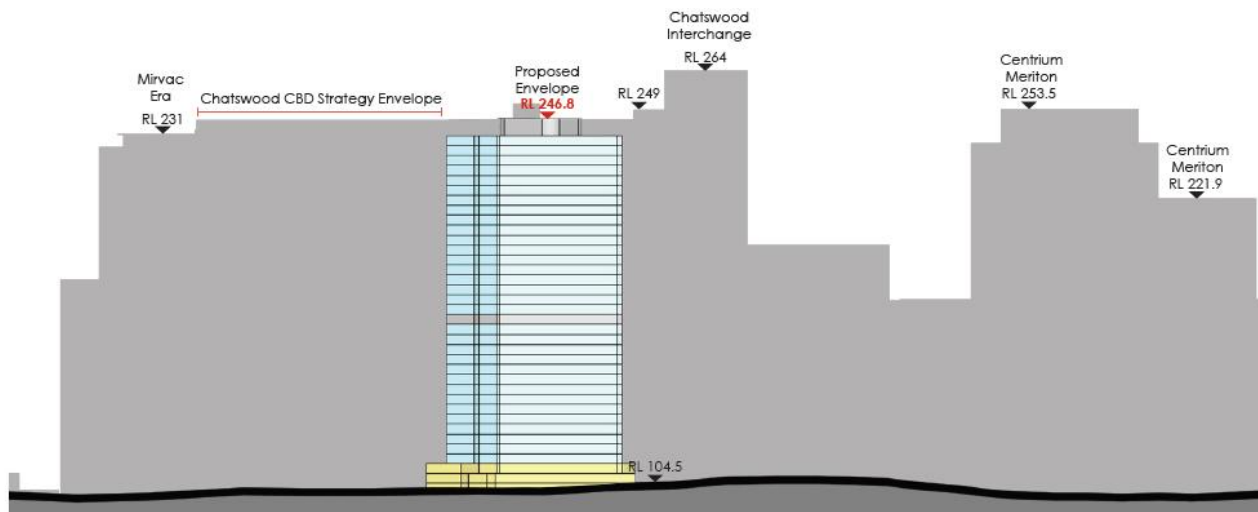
Proposed concept building envelope (west elevation) relative to the existing and proposed built environment in Chatswood and the Chatswood CBD Strategy envelope (source: a+ Design Group)
